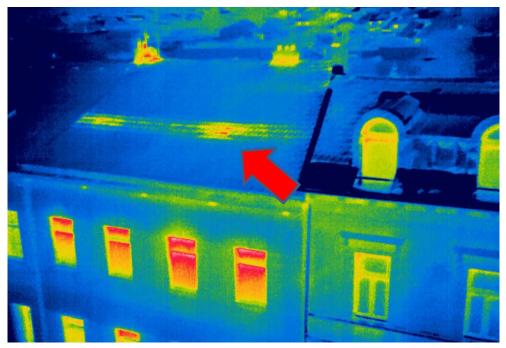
UAVs roof damage measurement caused by thermal bridges (8)
